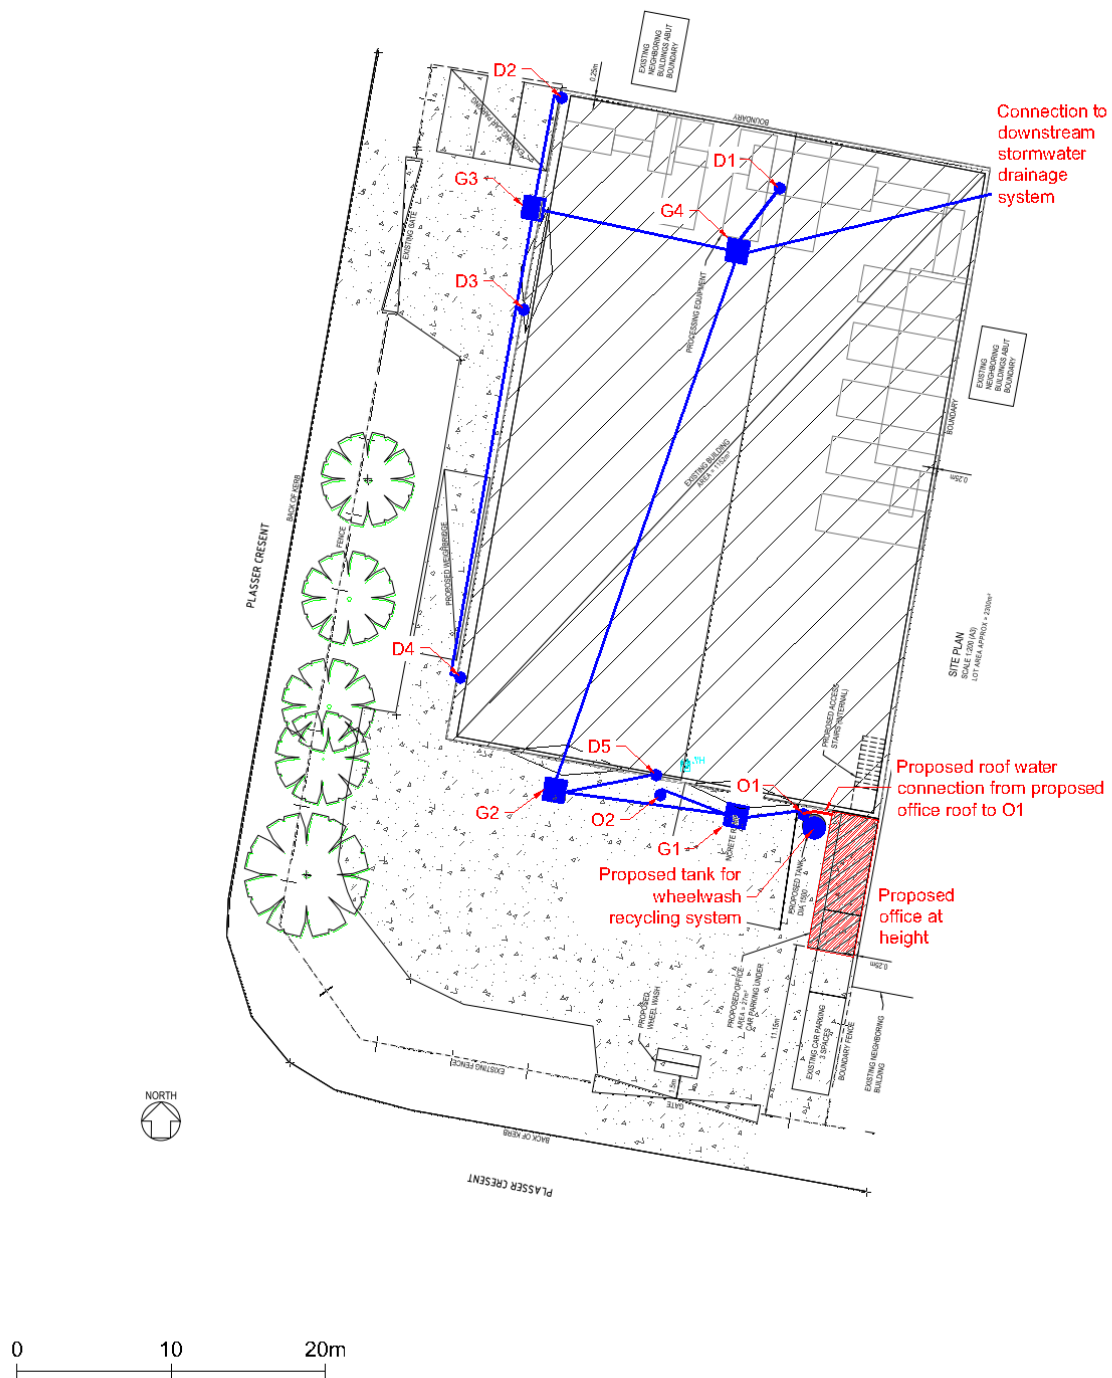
Roof Area to be drained and preliminary plan of gutters and downpipes
